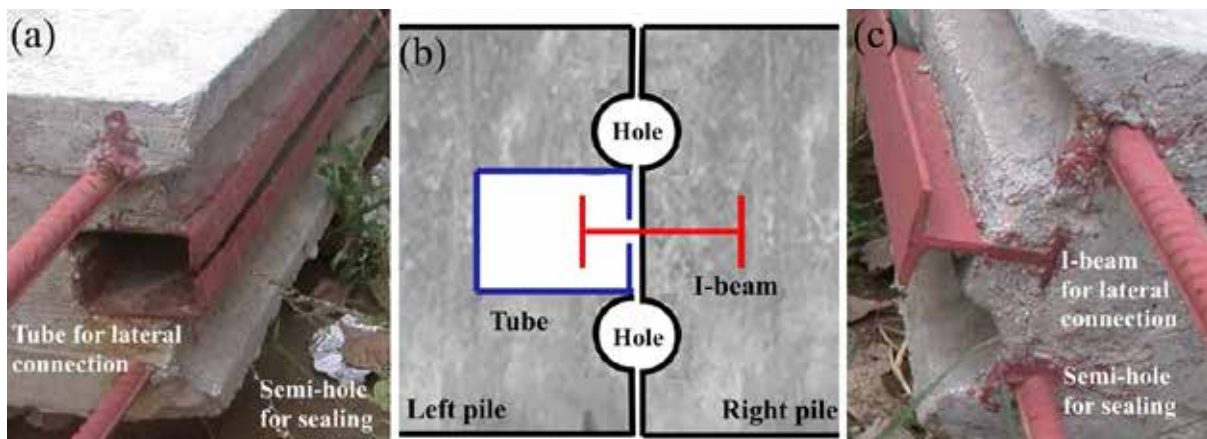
Steel tube or I-beam and two semi-circular hole on one side surface of pile for connection with grout in-situ
